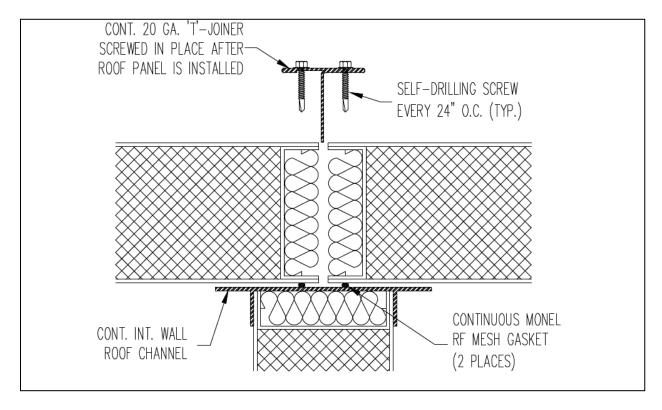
Fabrication details: typical interior wall intersection with roof. (Adapted from Noise Barriers, LLC, 2011.)
